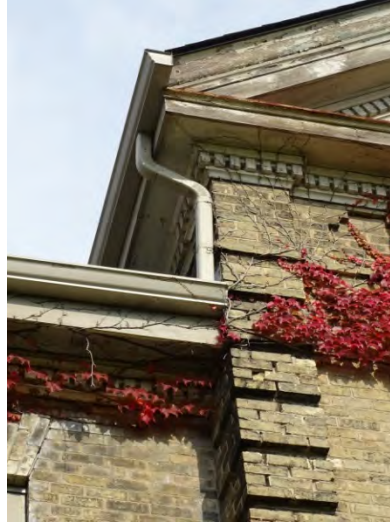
East Wing – South Elevation (Photo No. 85.1)
